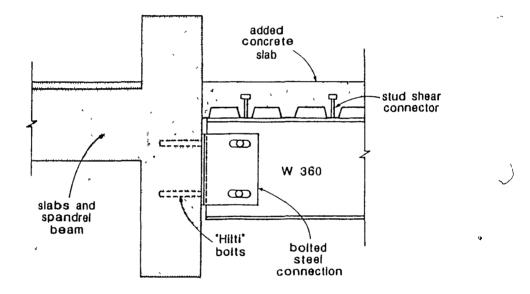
Shear Connection Between Added and Existing Diaphragms.
